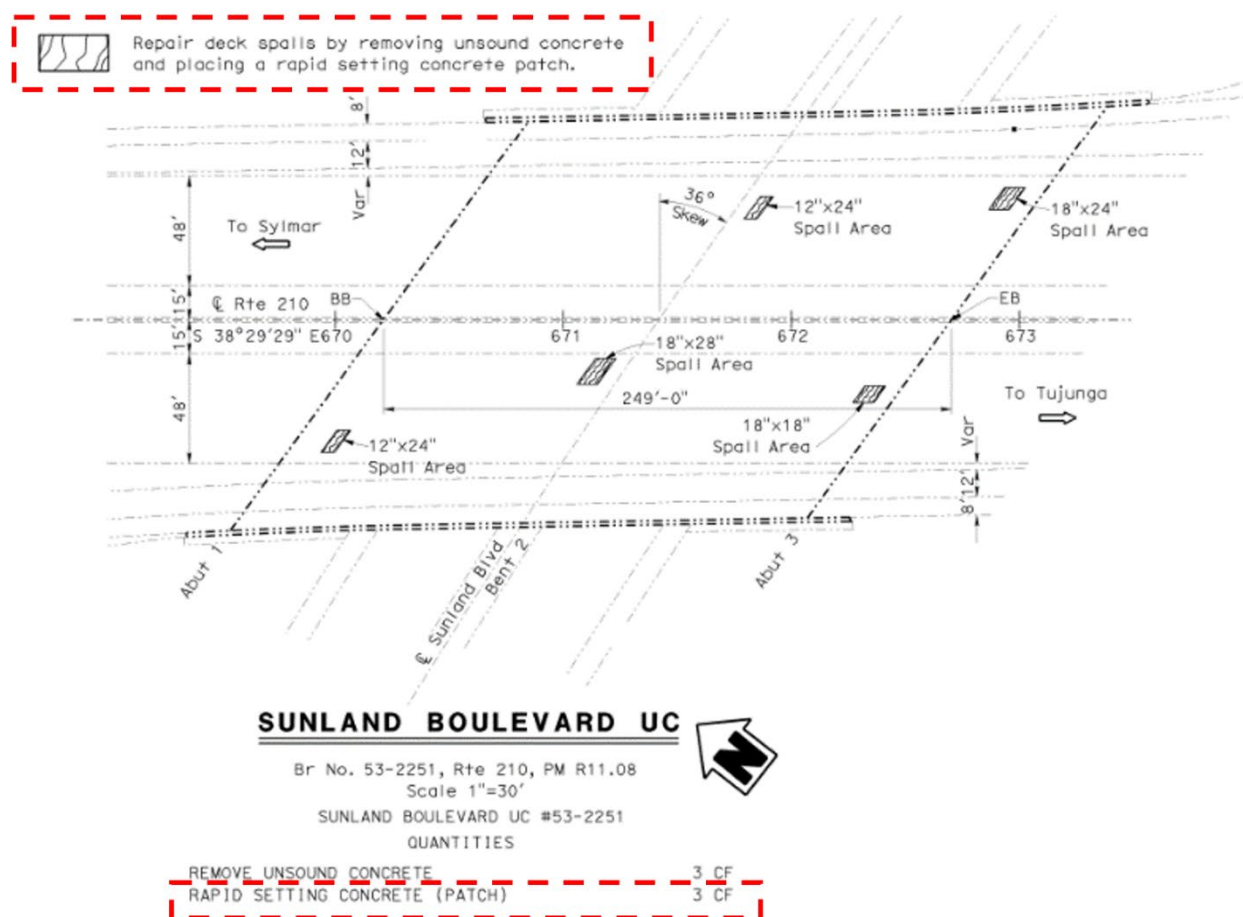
Bridge Plan Sheet Showing Specific Spall Repair Locations
